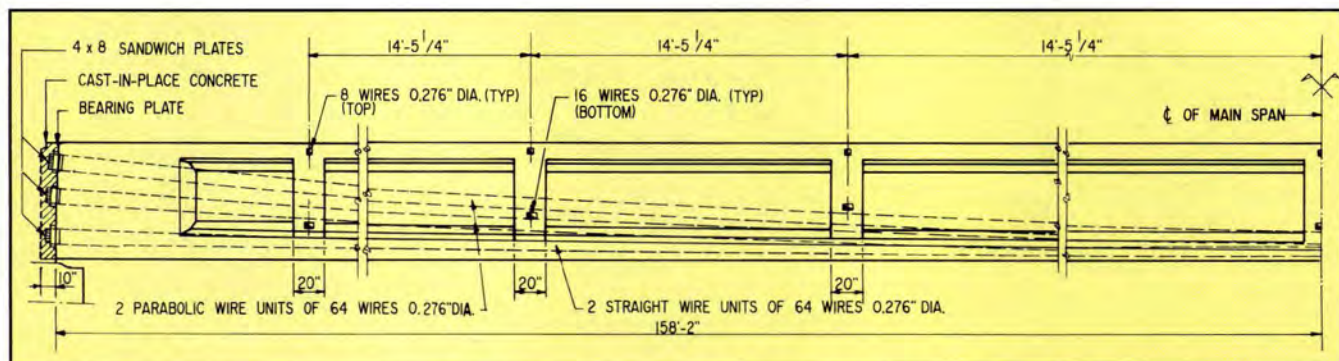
Profile of longitudinal post-tensioning wire units in the main span girder of the bridge, and location of transverse prestressing wire units. Before the forms were removed, the longitudinal wires passing through the sandwich plates were prestressed and anchored with wedges.
